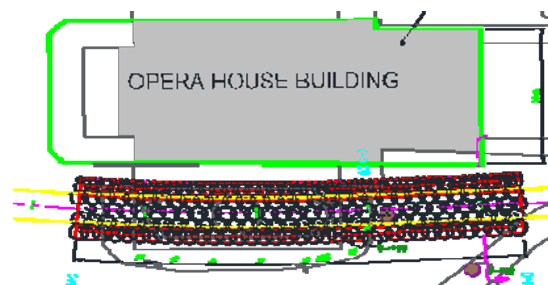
Jet Grouting layout for protecting the Saigon Opera House as a cut-off wall
